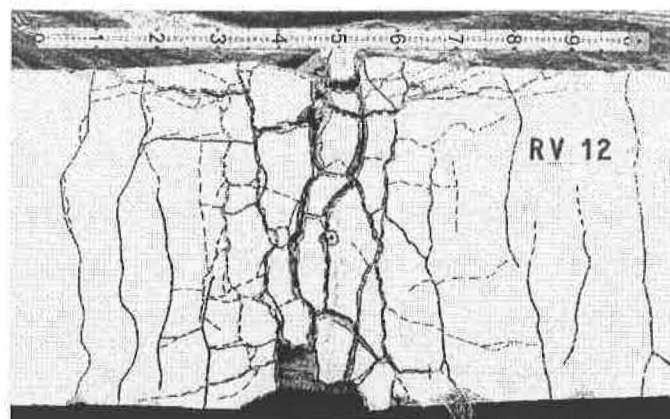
Final crack pattern of specimen RV12. Top view.
